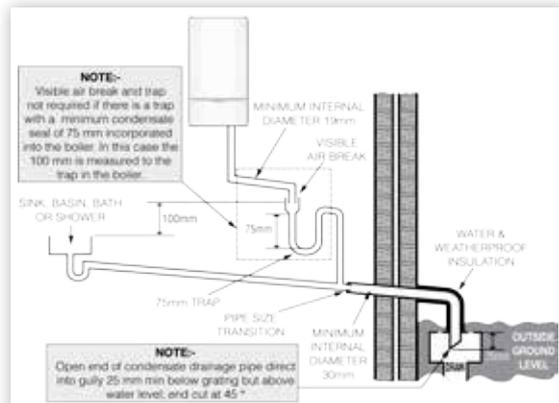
DOWNSTREAM CONNECTION FOR SINK, BASIN, BATH OR SHOWER TRAP
